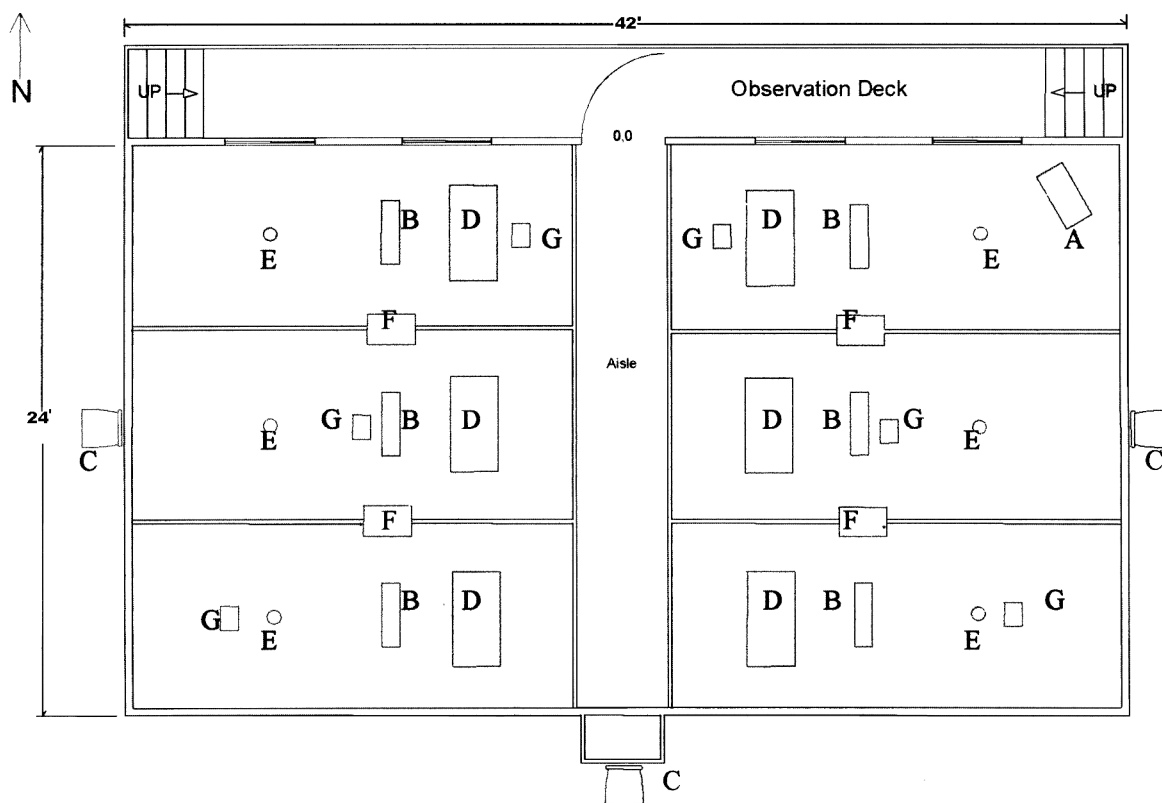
Floor plan of test chamber showing a typical layout of a ventilation system during test. A: LP heater (typical); B: Ceiling inlets (not typical); C: Wall fans (not typical); D: Pig heat simulators (typical); E: Hanging nipple drinkers (typical); F: Feeders (typical); G: Air speed and temperature sensors (typical).
